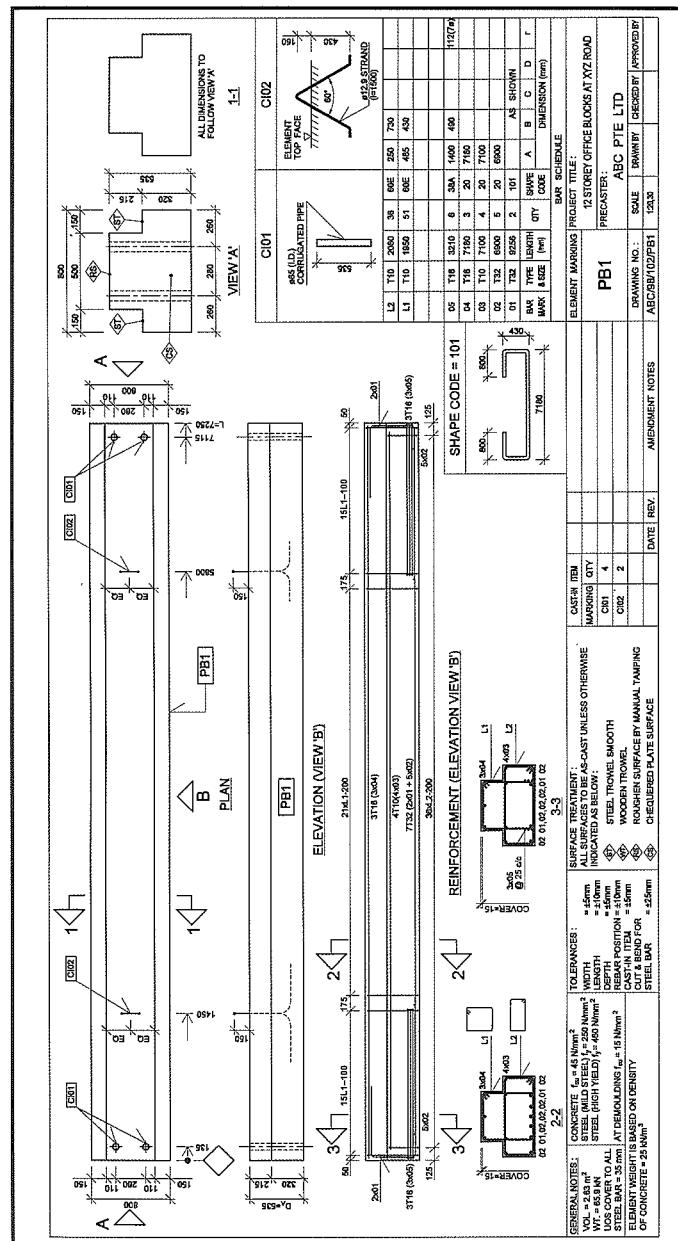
Production Details Of Precast Beam (12-Storey Office Block)
